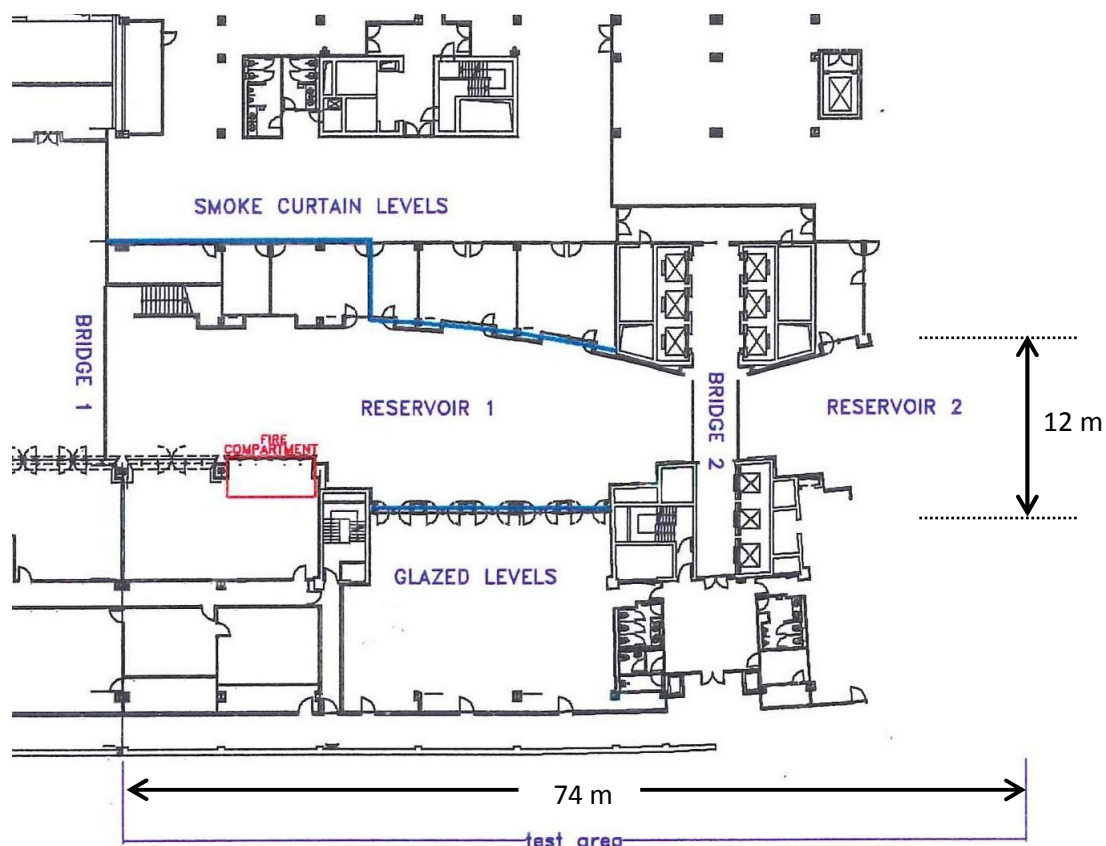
Schematic plan view of the test area (adapted from [54])
